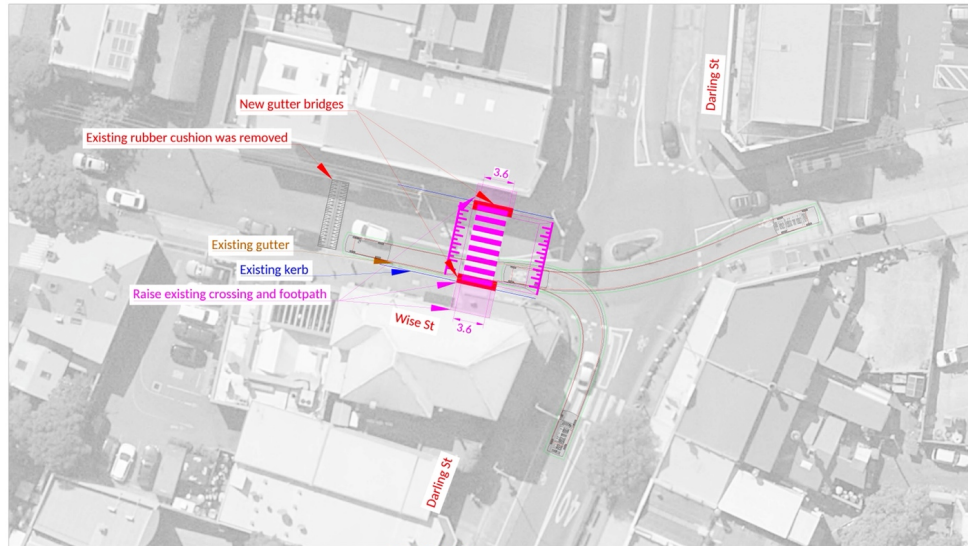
Darling Street / Wise Street / Beattie Street intersection proposal
